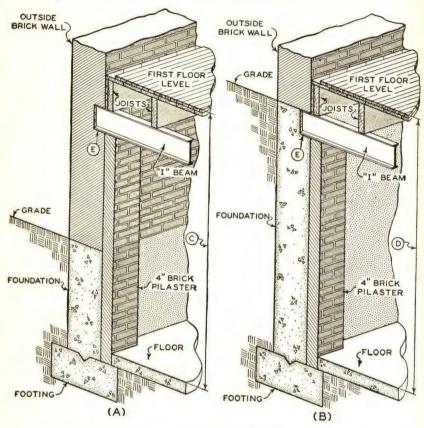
Beam Support in Brick Wall and Concrete Foundation
